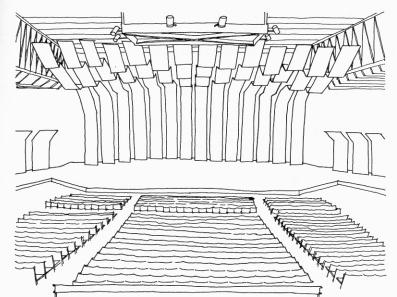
¹.2 Adjustable Acoustic System. Concert Theatre, C.W. Post Center, Greenvale, New York, Mitchell/Giurgola (architects), 1982.
